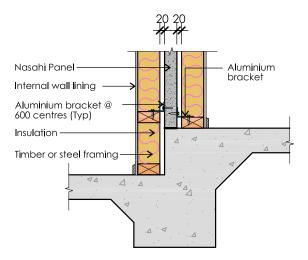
Base Slab Connection (Aluminium Wall Bracket)
